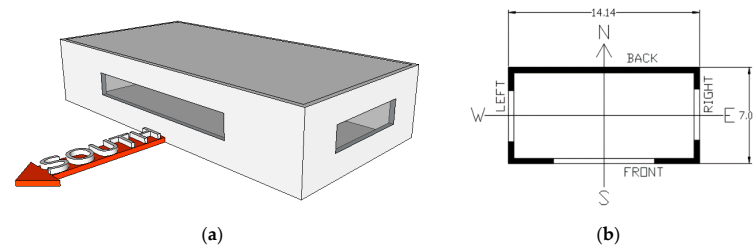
Visual representation of a 100-2-15-0 building: (a) 3D view; (b) floor plan (dimensions in m).
